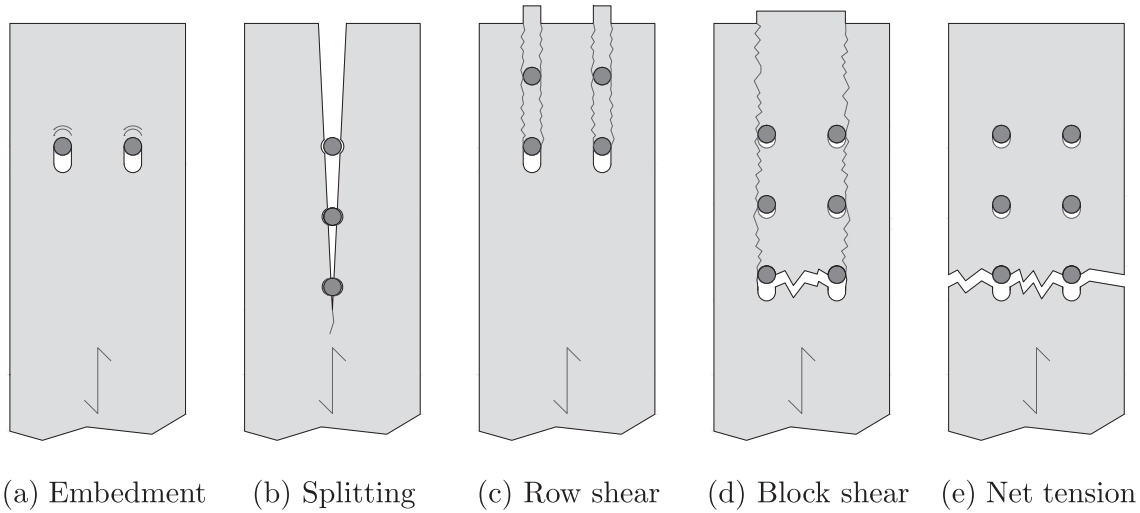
Possible failure modes of a timber connection with dowel-type fasteners: embedment (right hand-side, a) is the only ductile failure mode, the rest are brittle.
